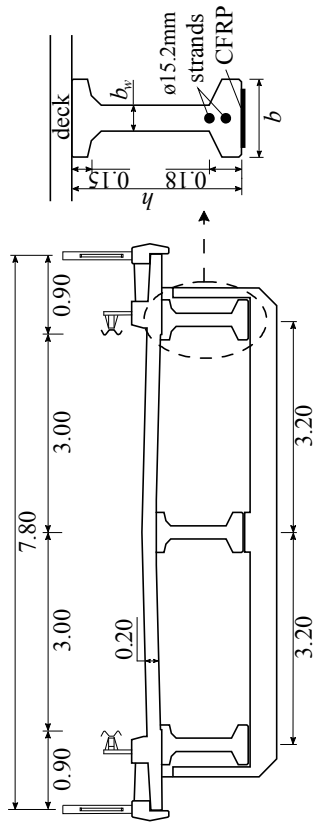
Cross-section and details of the exterior girder (dimensions are in meters if not stated otherwise).
